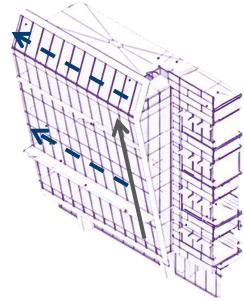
CURTAIN WALL GLAZING WORKFLOW
